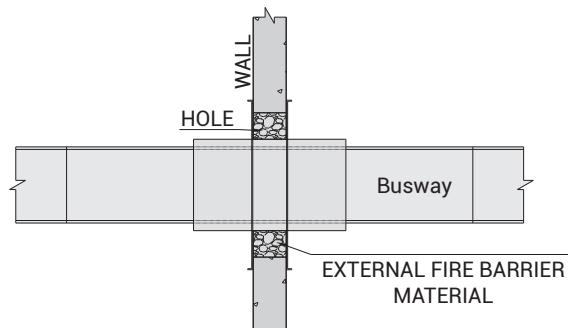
SAMPLE WALL CROSSING WITH FIRE BARRIER
